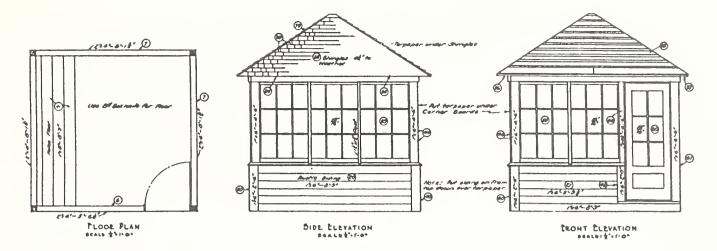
Patrol shelter or tower cupola, 1932, Northern District No. 1. Shown in plan as well as in side and front elevations, this eight foot square L-6 type structure could be used either on the ground or with T-1 and T-2 towers.
